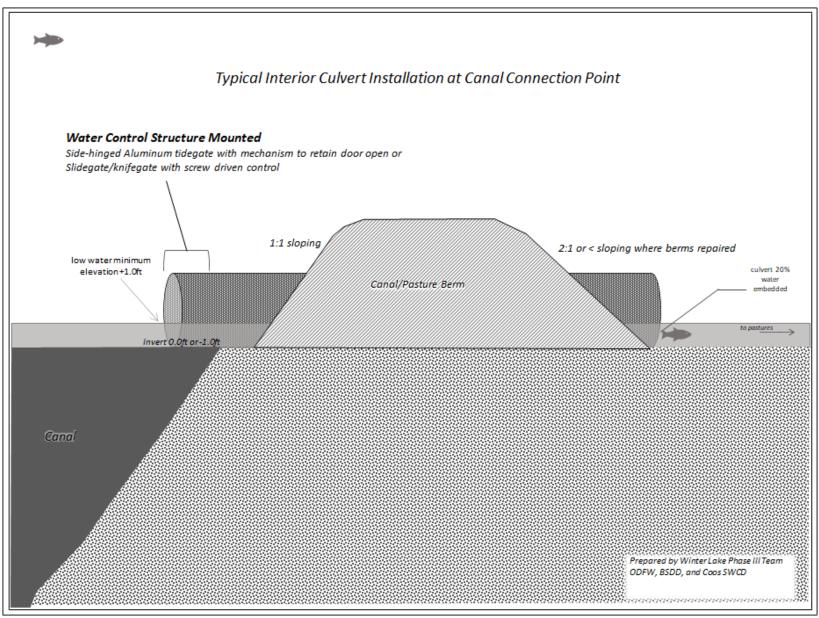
Winter Lake Phase III project typical interior culvert installation design.
